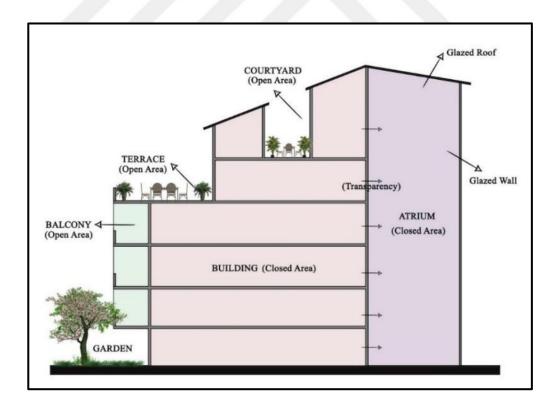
Open spaces in high storey buildings (Drawing by Author)
